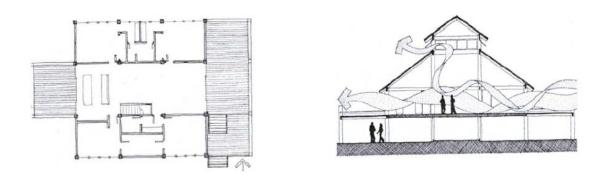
Logan House Plan and Section, Tampa, Florida, Rowe House Associate
